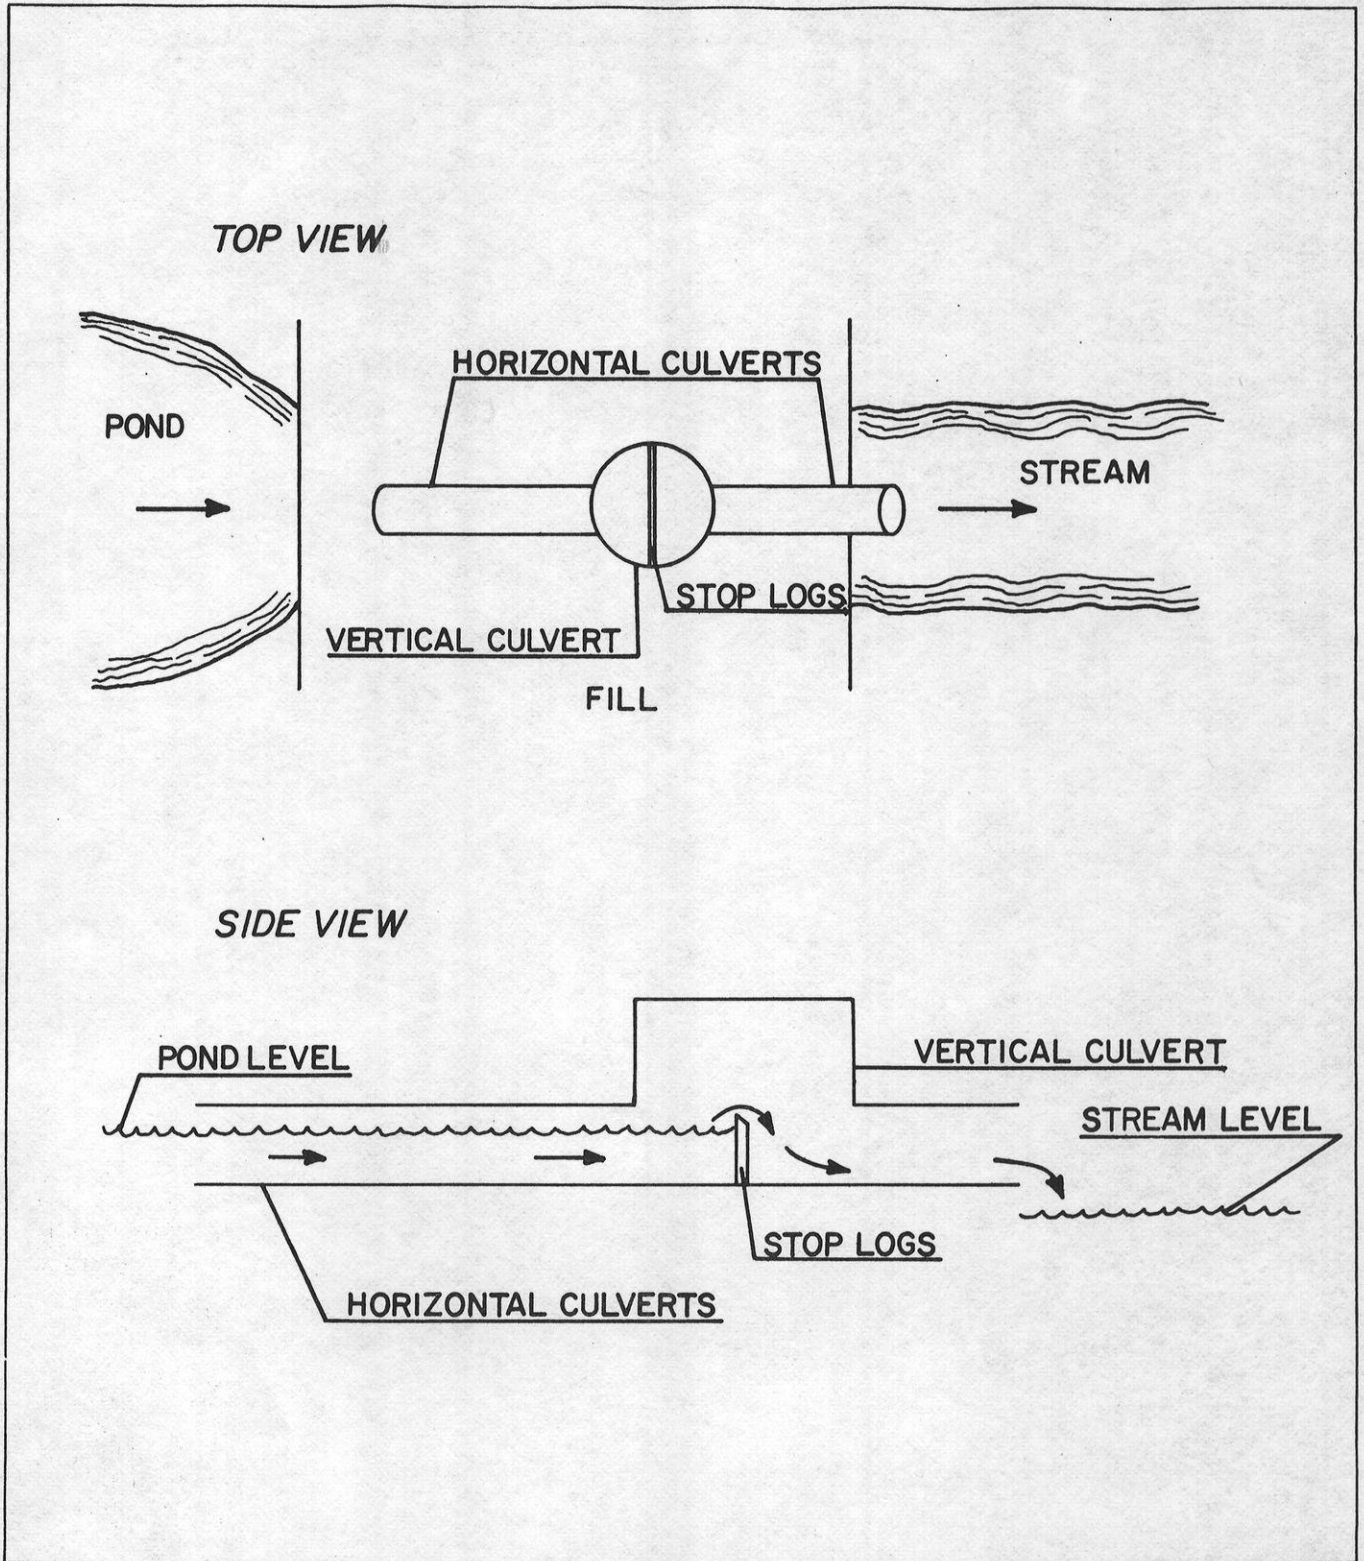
Drawing of outlet structure at Beaver Lodge Pond, Washburn County.
